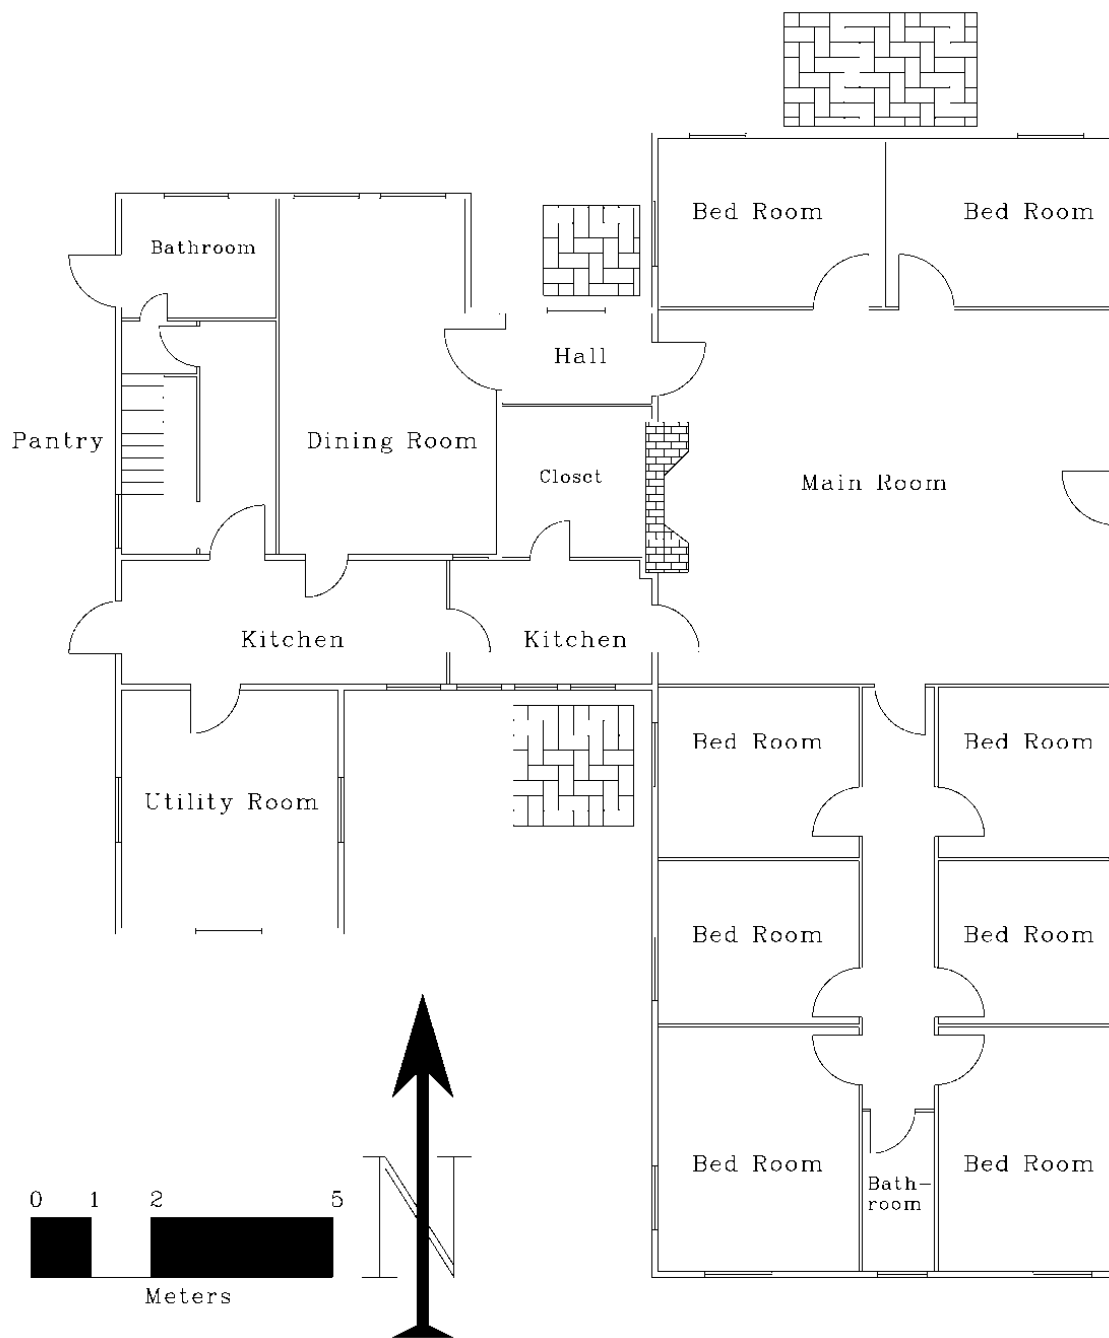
Proposed floorplan for the Hunt Club Lodge's third construction phase. The areas between the three discrete original buildings have been enclosed and turned into a hallway (north) and two kitchen areas (middle). The servant's quarters has been converted to a utility room. The old kitchen has been converted into a pantry and a staircase has been added. A second floor has been added above these new areas.
